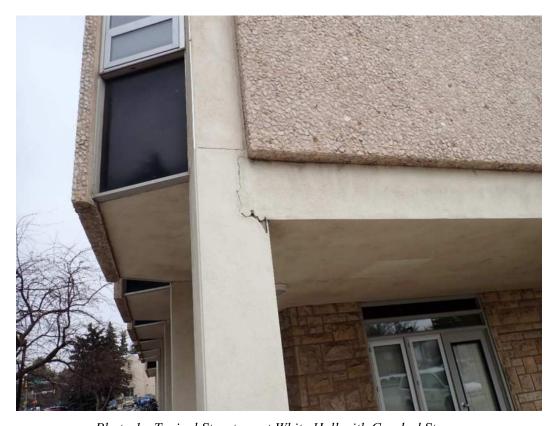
Typical Structure at White Hall with Cracked Stucco
